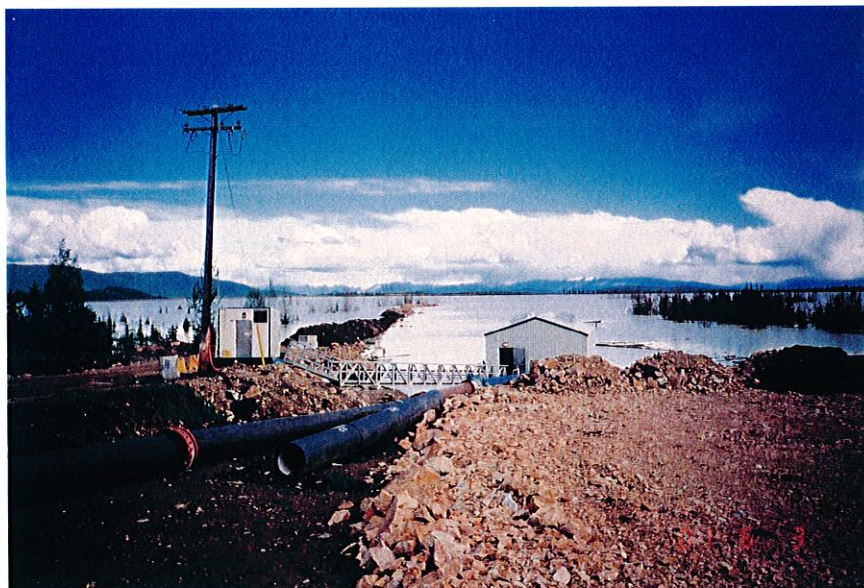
Main Embankment Seepage Collection Pond from Main Embankment Crest- Looking South
